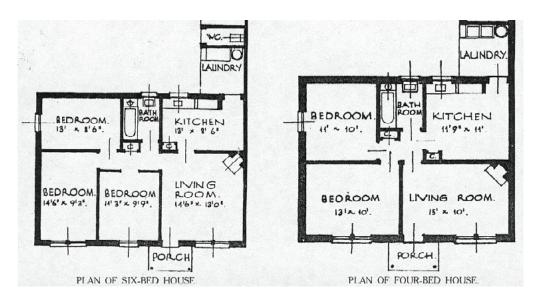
Typical plans of the medium size dwellings. Source: Second Report of the HCV, 1940.
